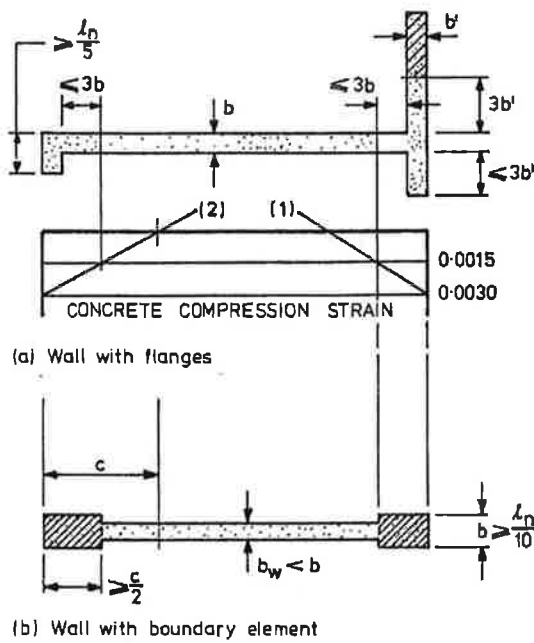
PARTS OF WALL SECTIONS TO BE CONSIDERED FOR INSTABILITY
